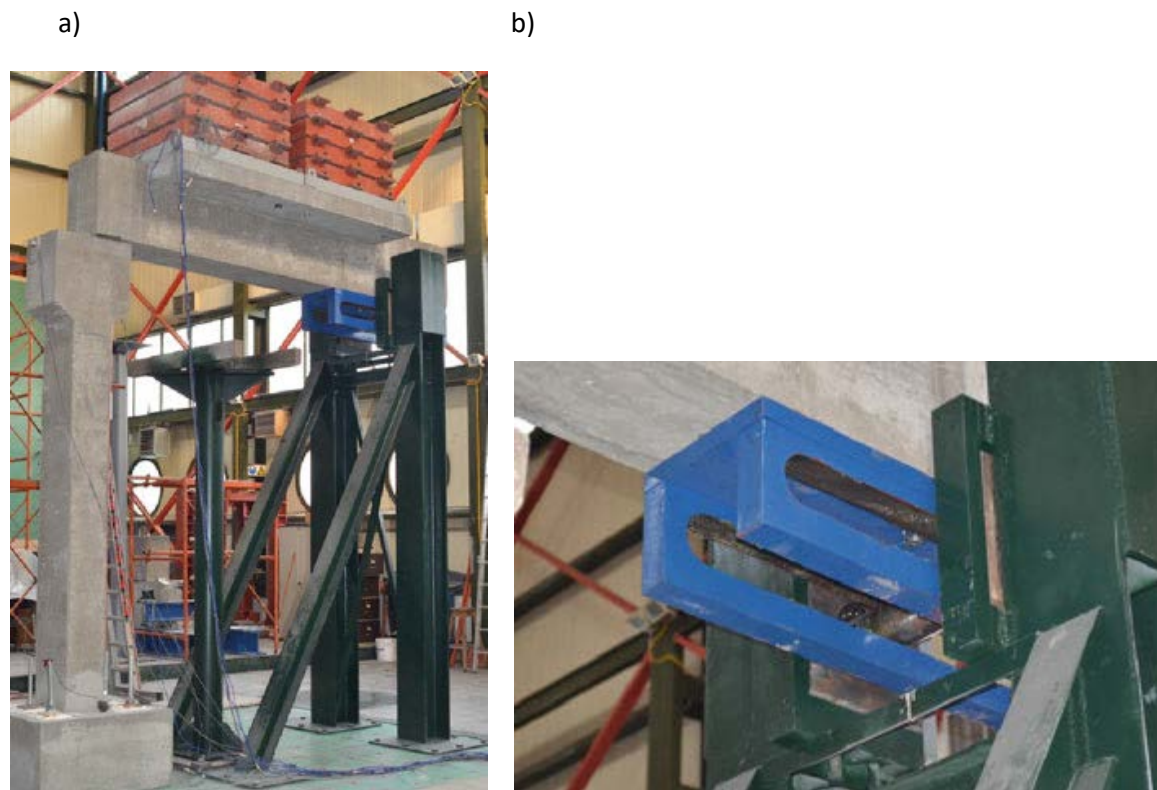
Experimental set-up details; a) Overall specimen, b) detail of sliding achievement on the middle beam [Ref.: 033]
